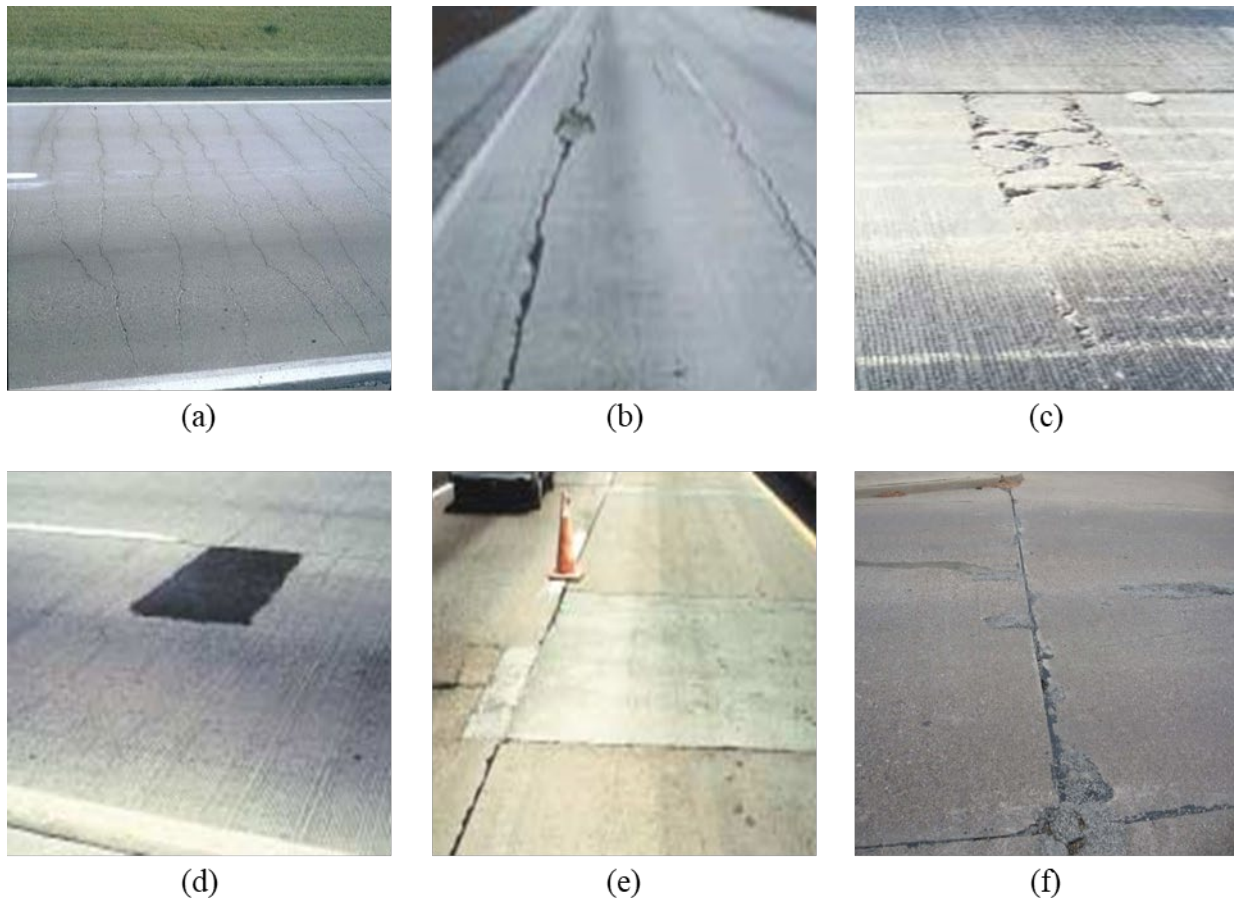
Distresses on rigid pavements: (a) Transverse cracks; (b) Longitudinal cracks; (c) Punchouts with severe chipping and spalling; (d) Asphalt patch; (e) Concrete patch; (f) Joint failure. Modified after FHWA Distress Identification Manual for the Long-Term Pavement Performance Program, Fifth Edition (*Distress Identification Manual for The Long-Term Pavement Performance Program (Fifth Revised Edition)*, 2014) and TxDOT Pavement Rater's Manual 2021 (*Pavement management information system, rater's manual fiscal year 2021*, 2020)
